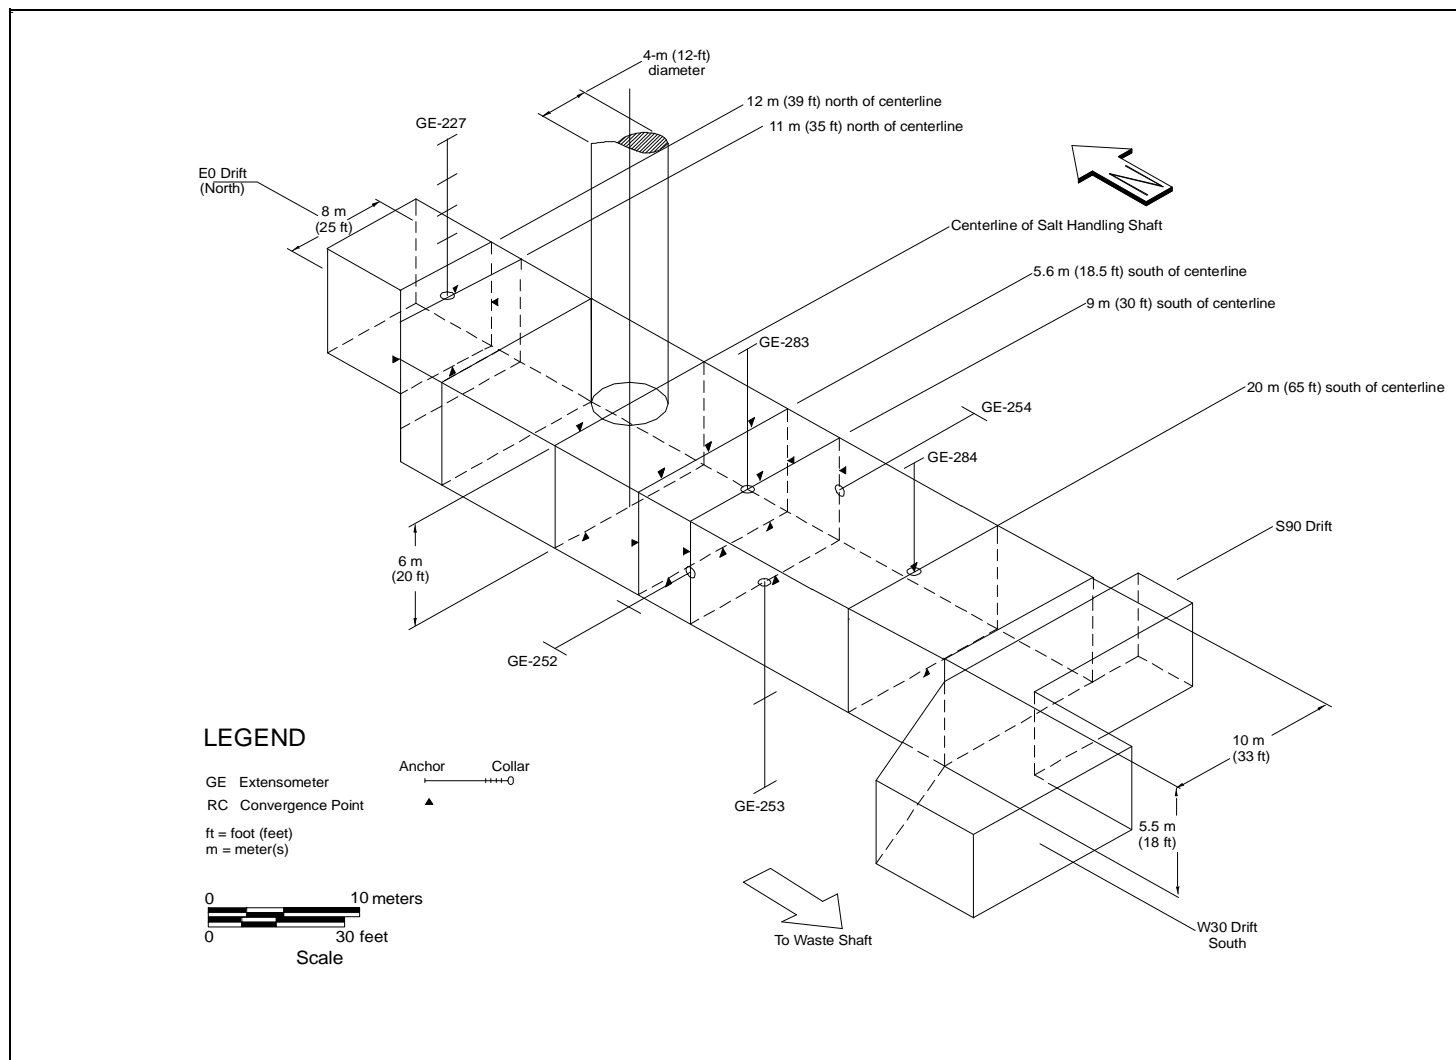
Salt Handling Shaft Station Instrumentation After Roof Beam Excavation
